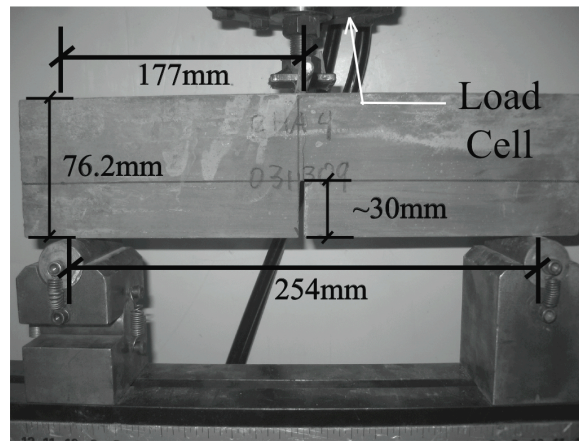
Experimental test set-up for measuring matrix fracture toughness.
